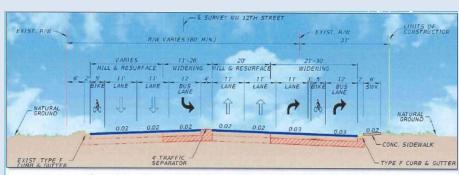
Proposed Typical Section from Dolphin Station Road to HEFT
